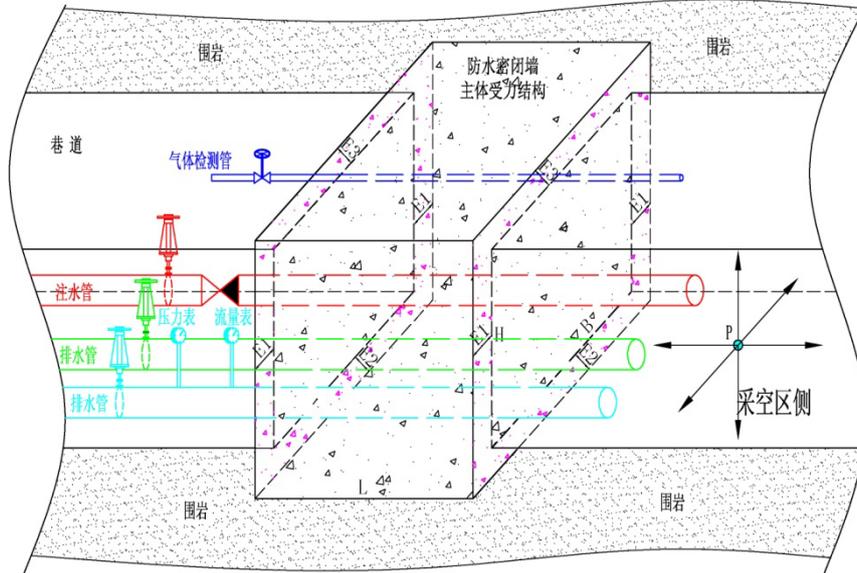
Structural Diagram of Waterproof Sealing Wall
